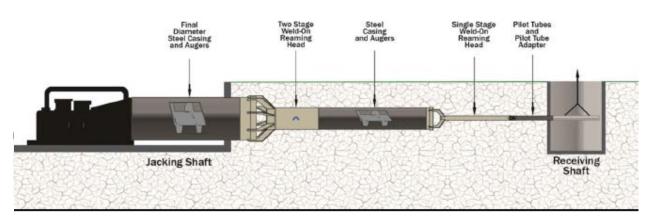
Pilot Tube Guided Auger Bore and Jack
